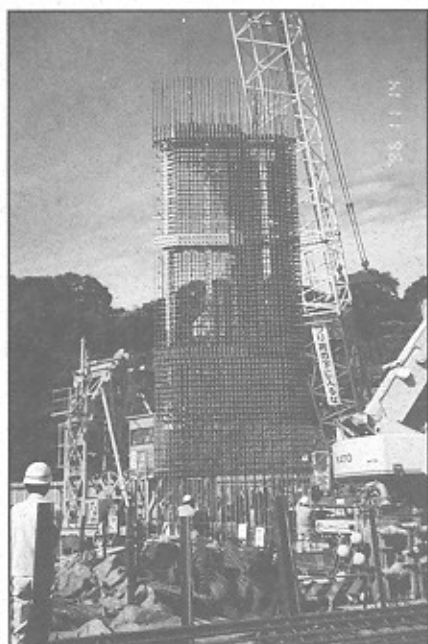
NEFMAC for Concrete Wall, Kawagoe, Japan
